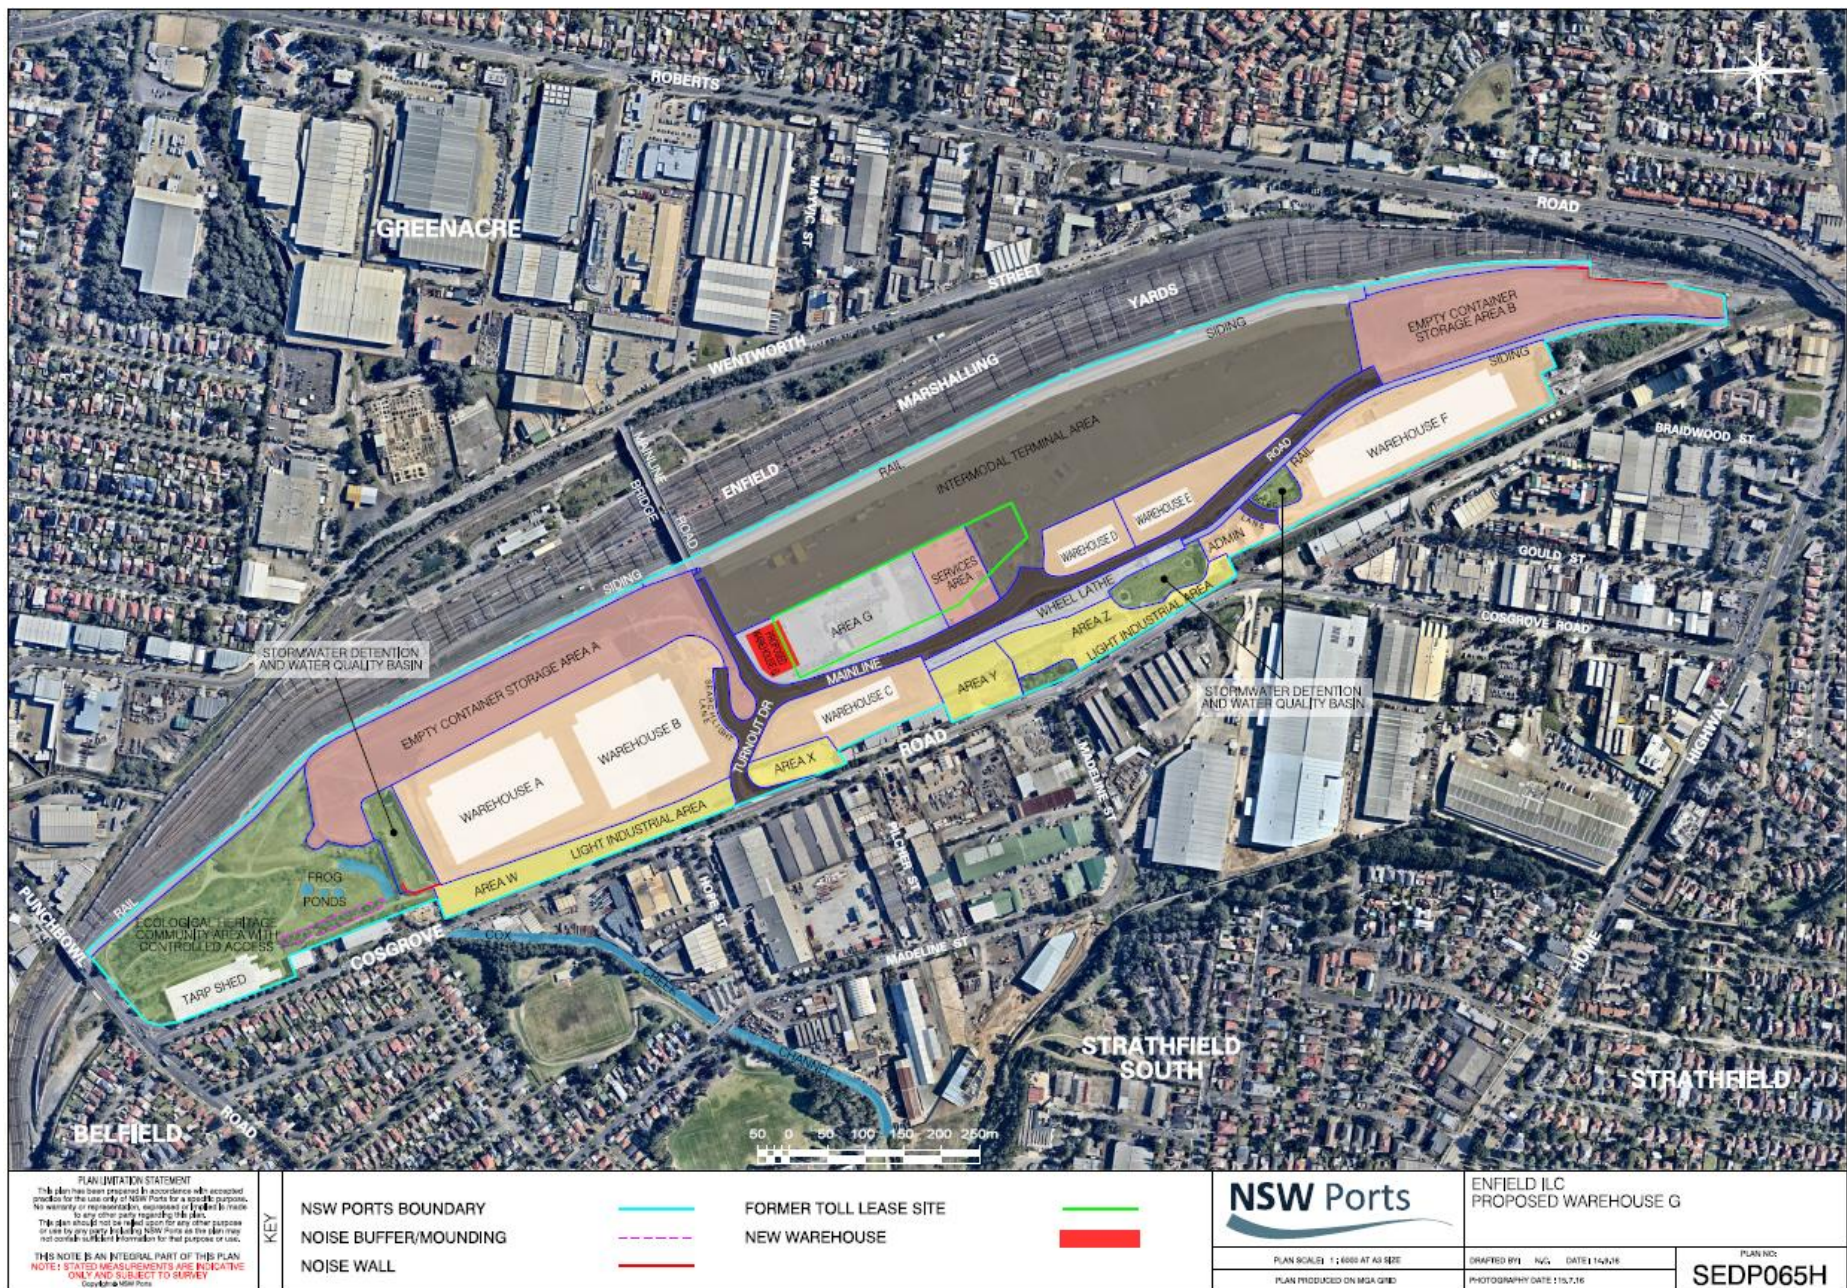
Proposed Warehouse G Location (source: NSW Ports)
